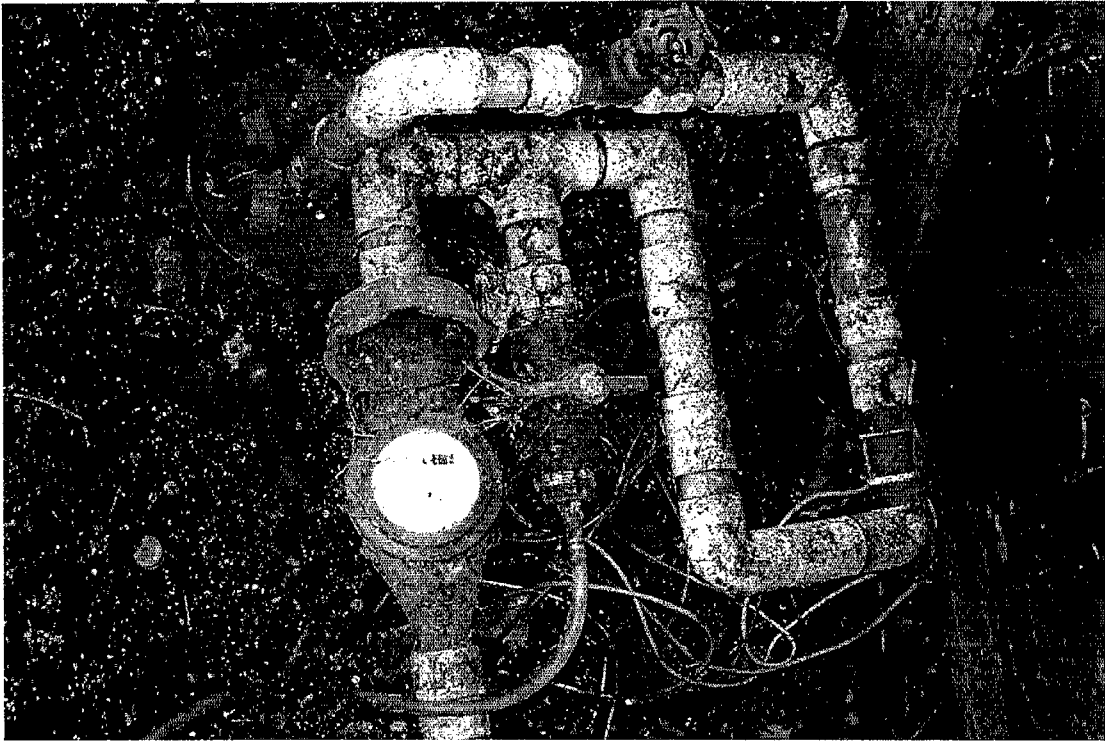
Extraction well ES2W, located north of building at 1931 Plymouth Street.
